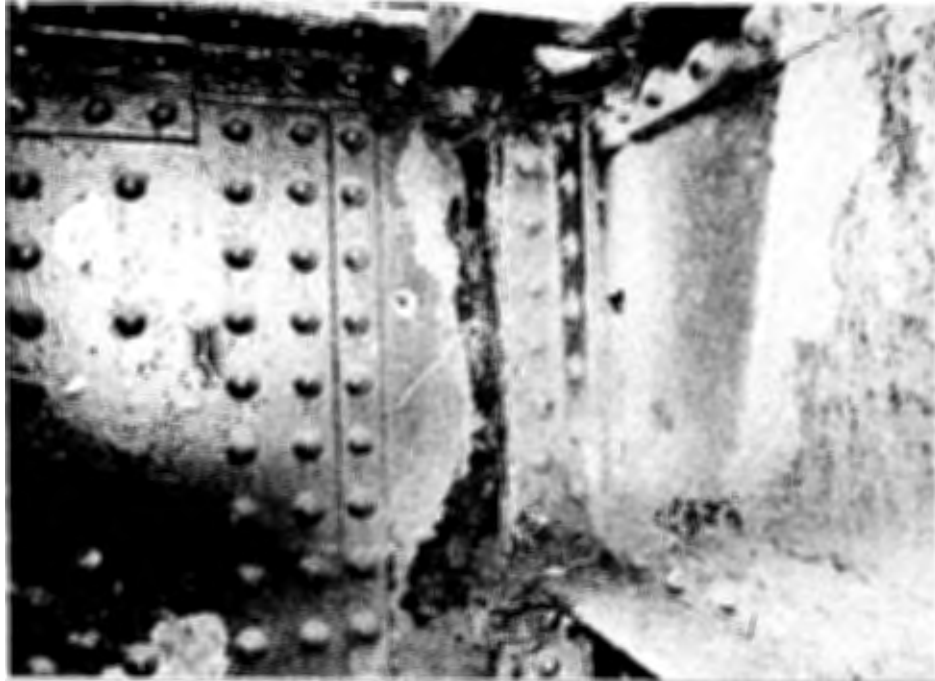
Corroded floor beam web along the vertical angle connection of transit support girders.
